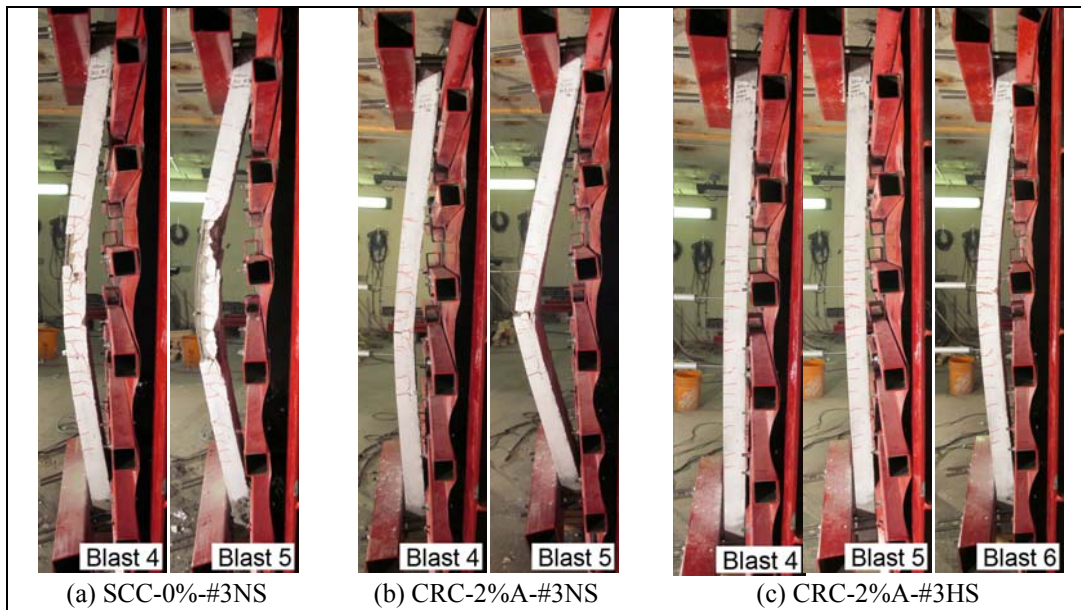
Typical cases of cracking and failure for slab specimens subjected to blasts 4-6
